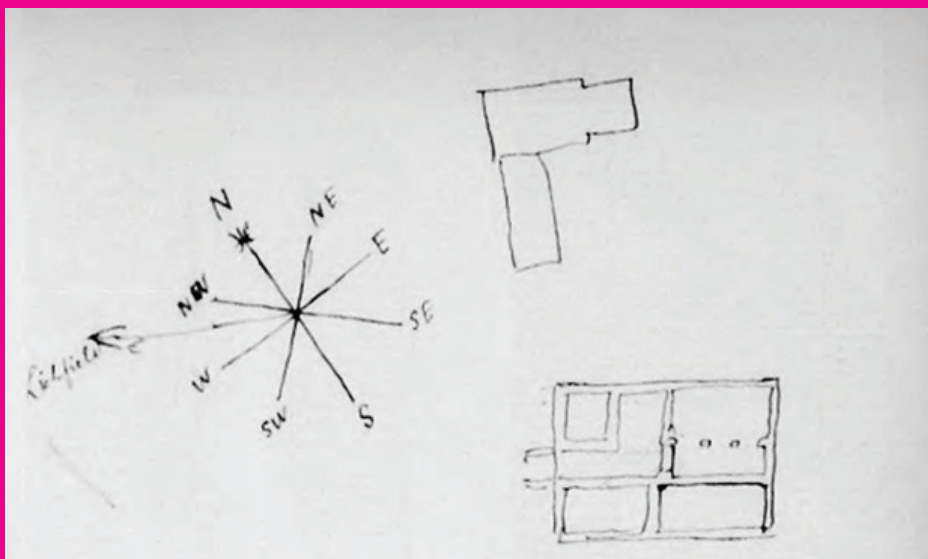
Steere’s drawing of a floor plan of a chapel at Kingskerswell, 1857.¹
